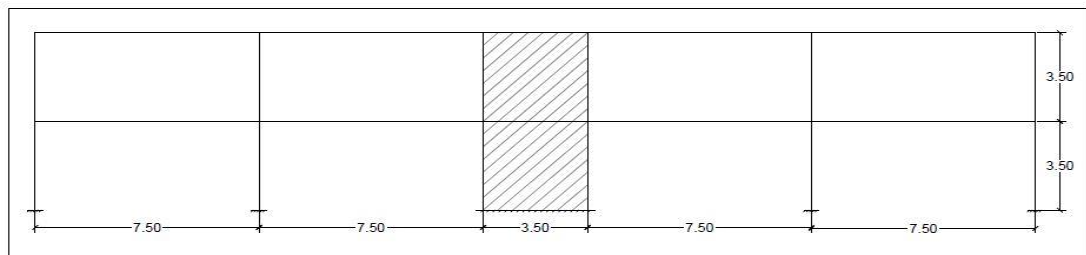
Elevation of 2-story building with steel plate shear walls having different plate thicknesses
